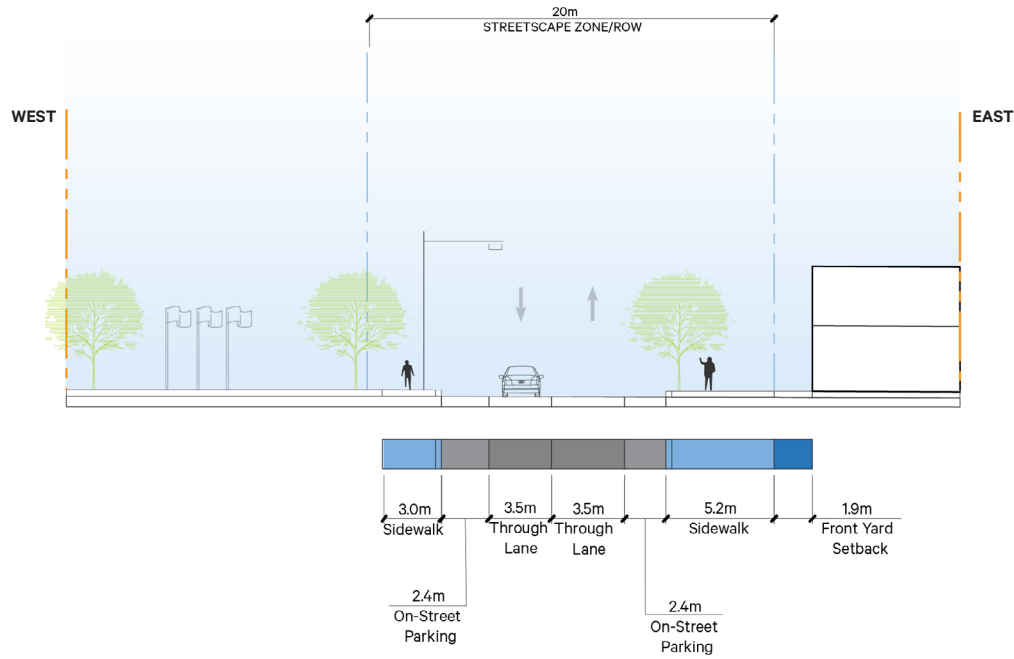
Cross Section of Existing Conditions on King Street East between Lambert Street and St. George Street
